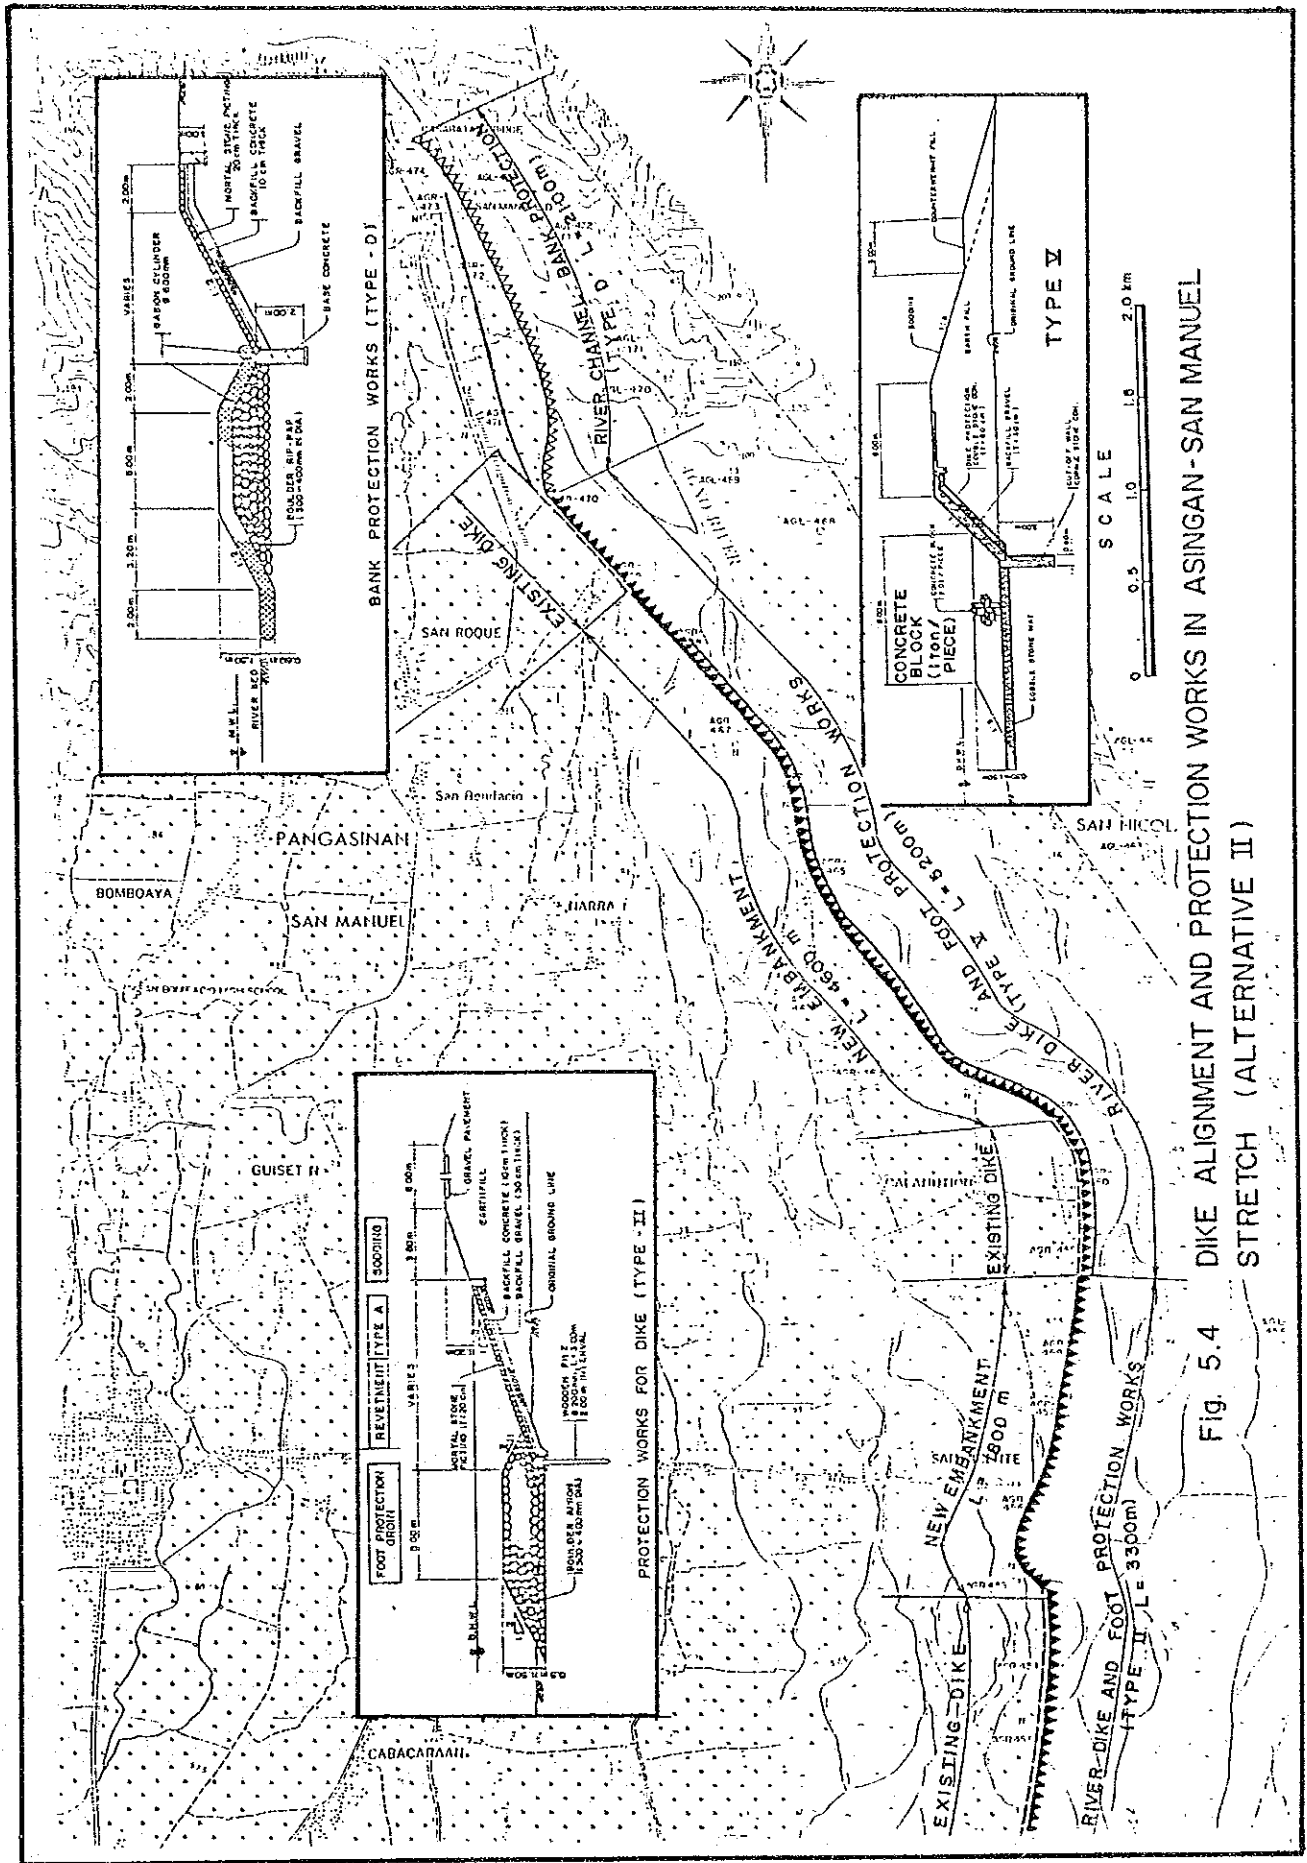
DIKE ALIGNMENT AND PROTECTION WORKS IN ASINGAN-SAN MANUEL STRETCH (ALTERNATIVE II)
